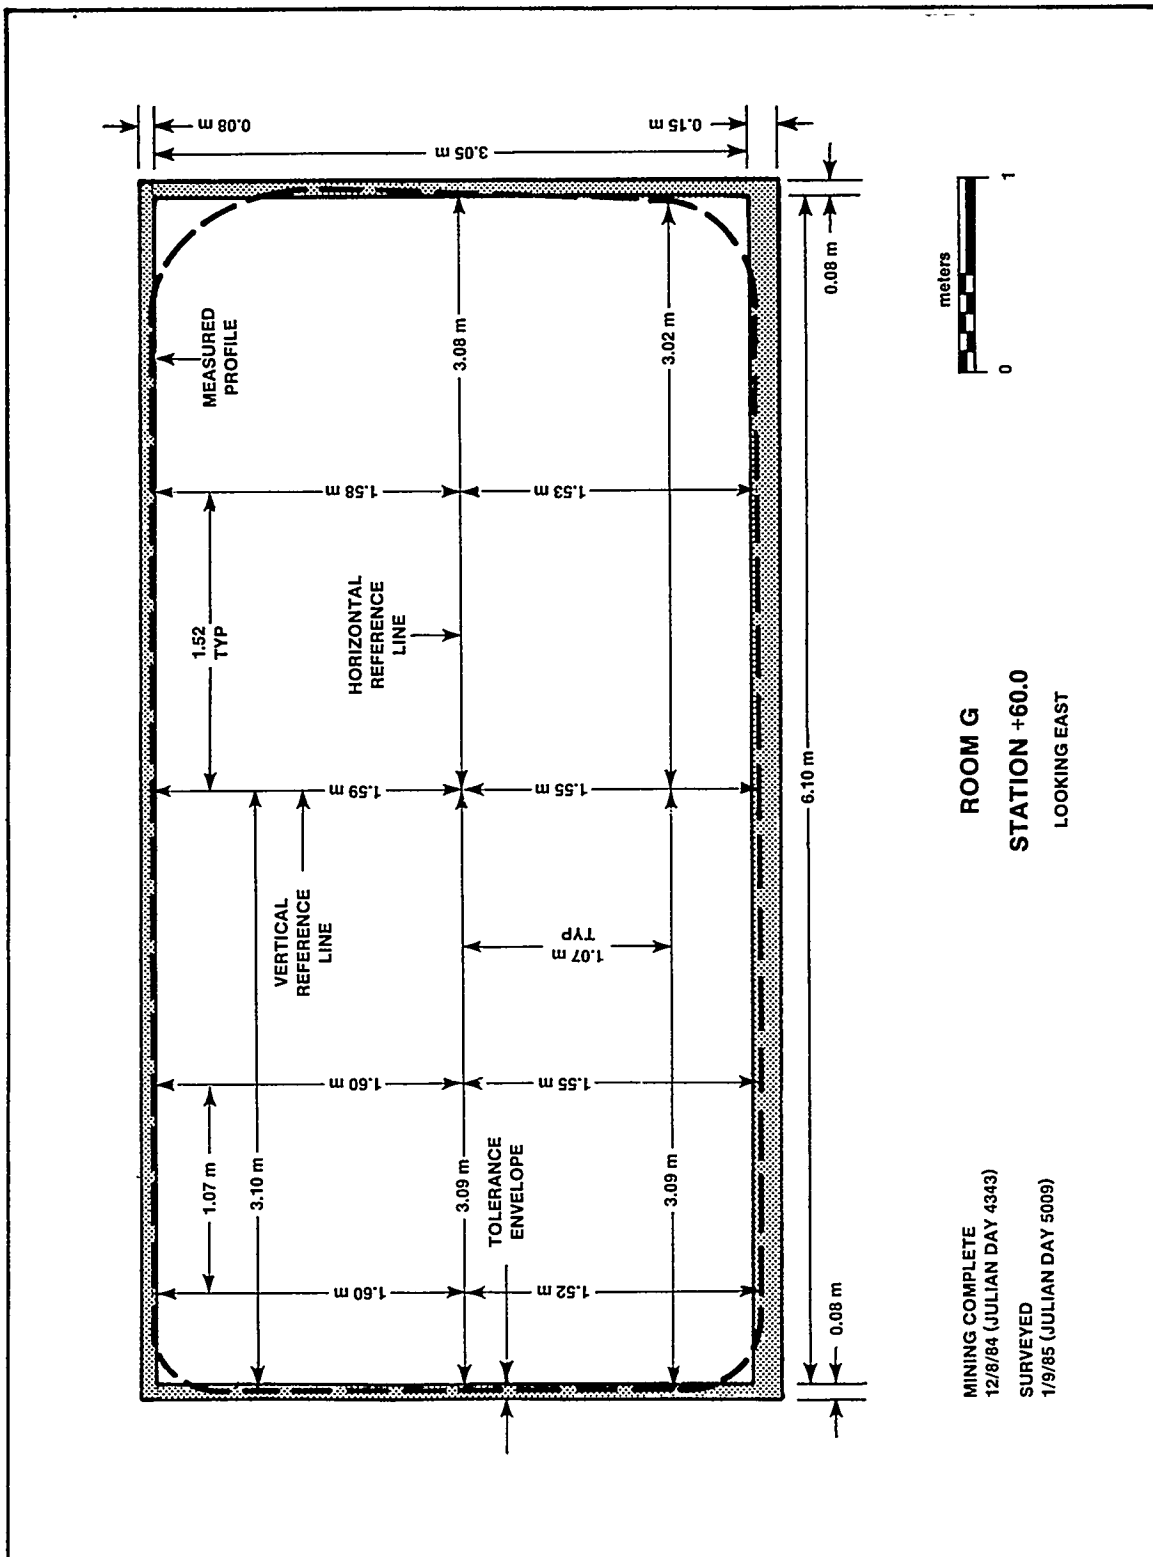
As-Built Cross Section of Station +60.0 m, Room G
